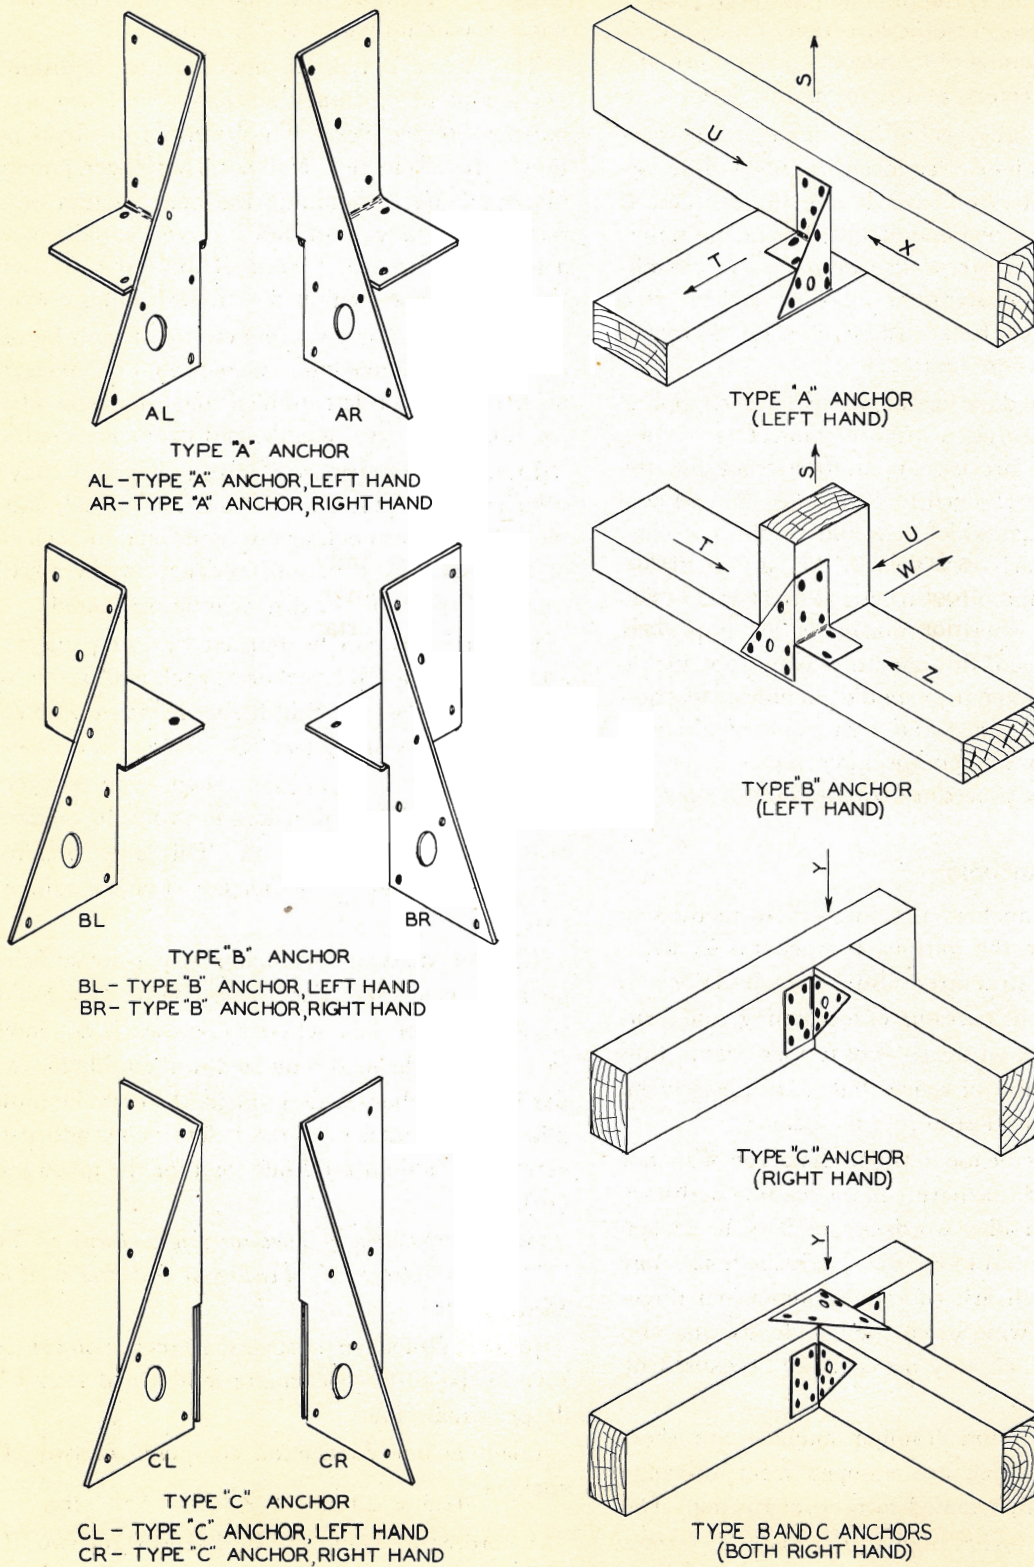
Types and Applications of Sheet Metal Anchors.
